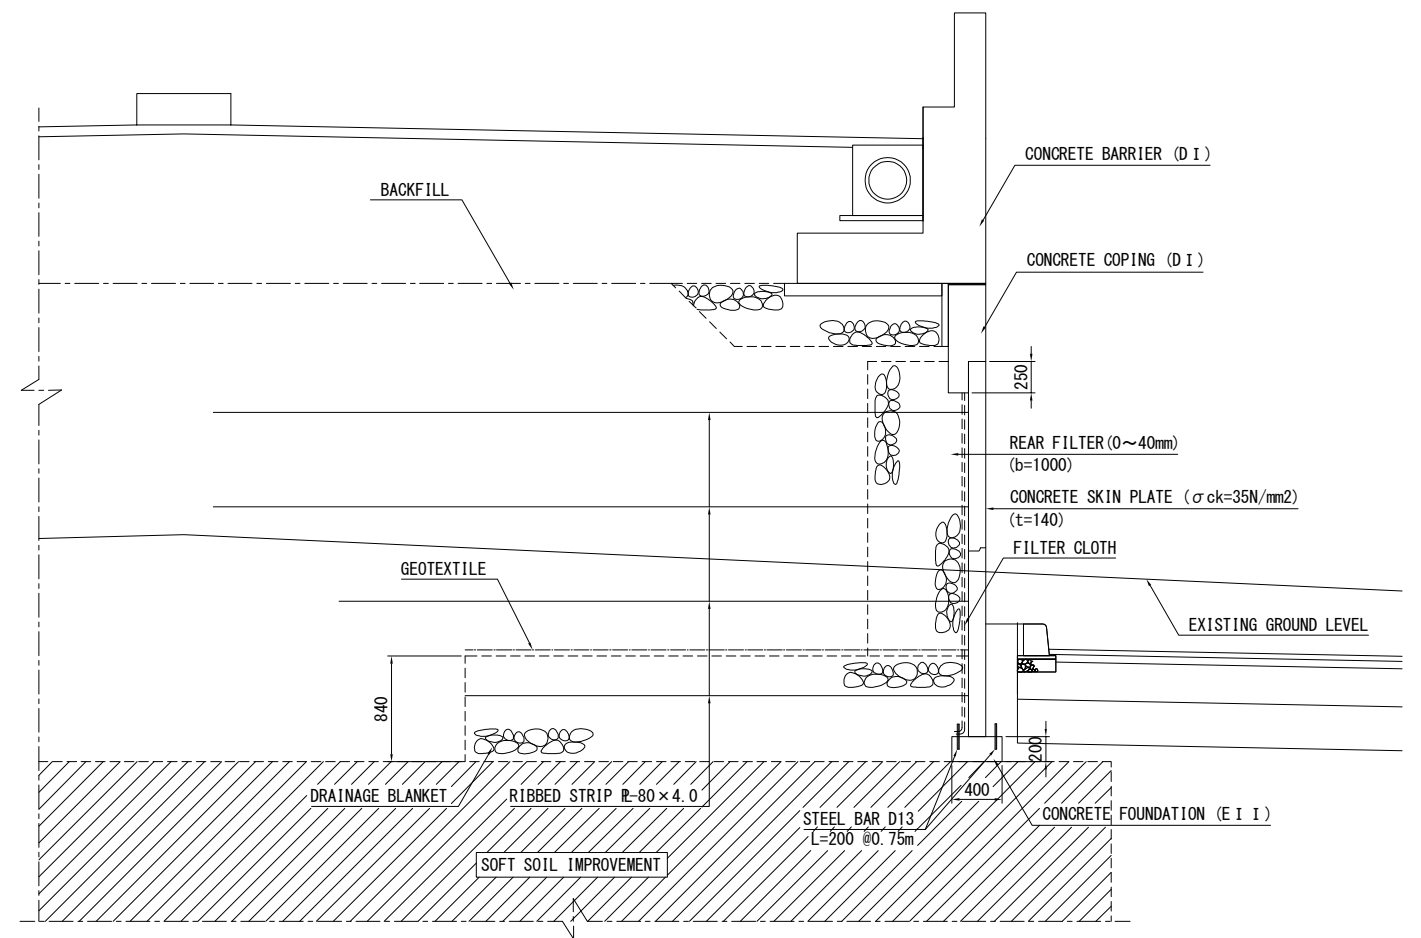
# DETAIL OF MECHANICALLY-STABILISED EARTH WALL(1)
